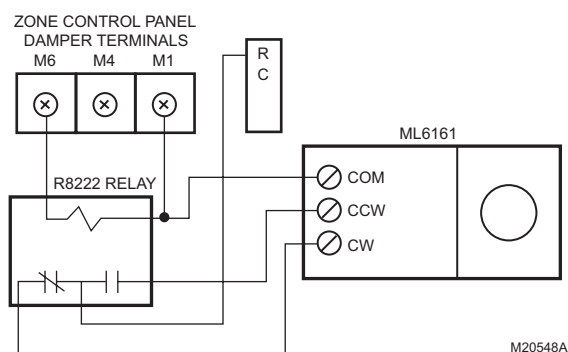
MARD or ML6161 Damper Motor Actuator using R8222 Relay wiring.
